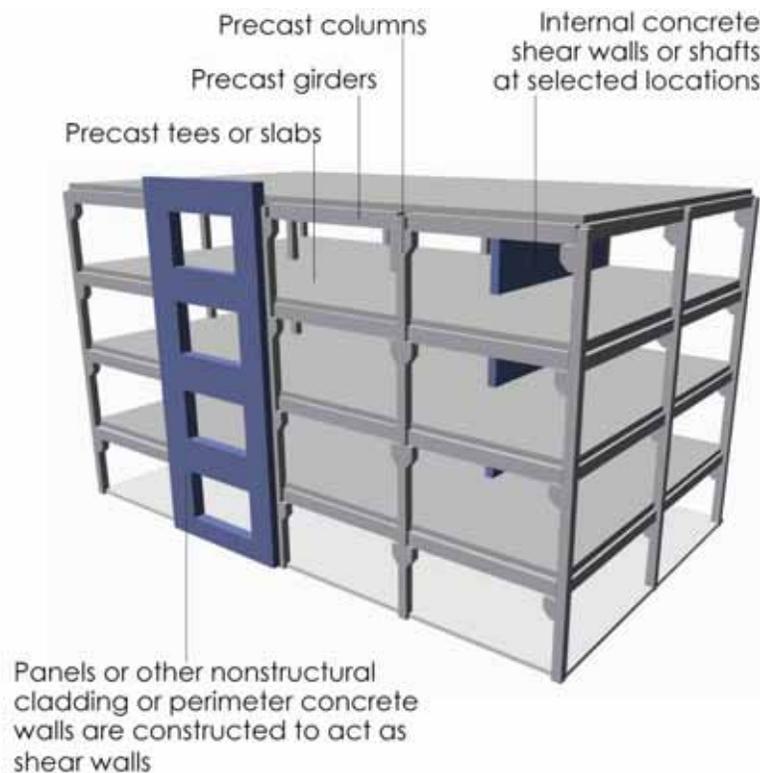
Building Type PC2: Precast Concrete Gravity Frames with Shear Walls
